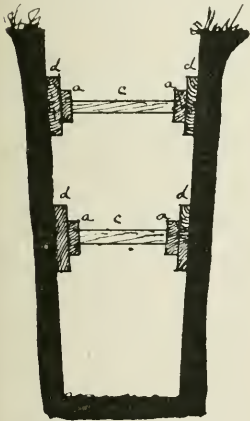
a, Wales. c, Struts. d, Poling boards.
